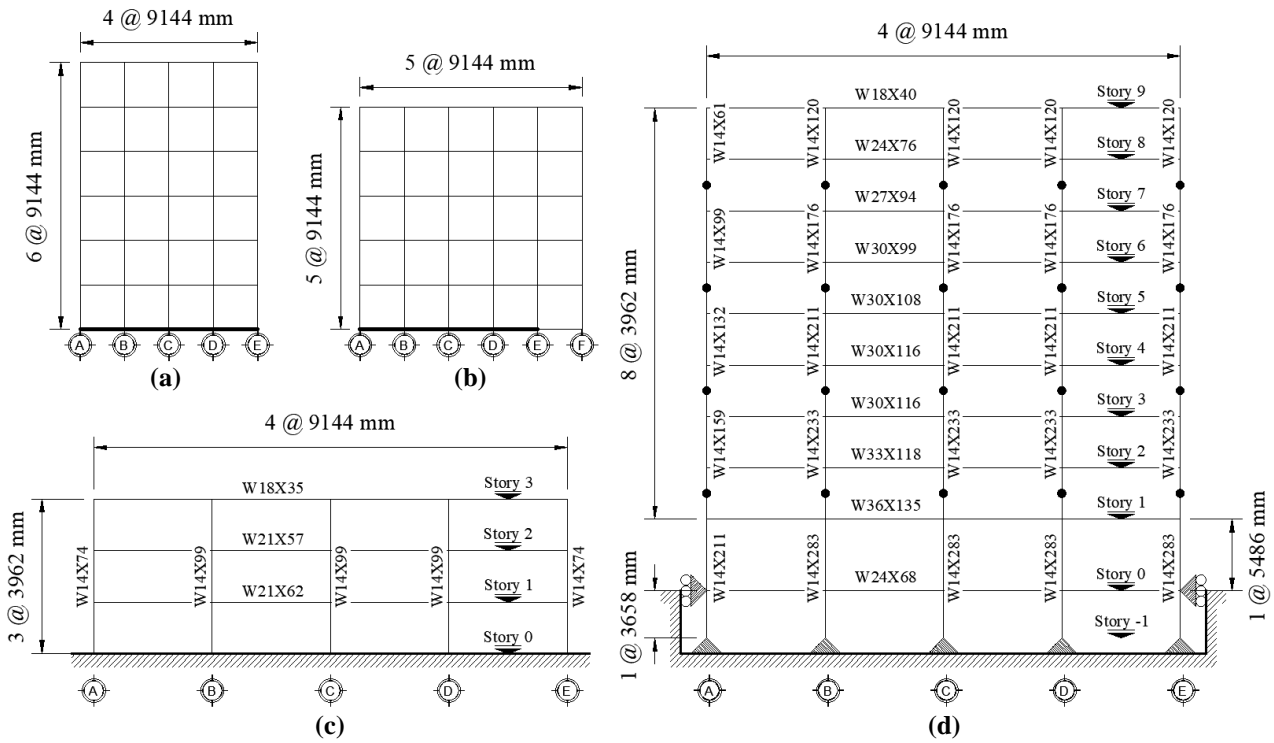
Plan view of (a) building 3B and (b) building 9B. Elevation view of N-S perimeter steel MRF for: (c) building 3B and (d) building 9B. (As reported in Gupta and Krawinkler [29]).
